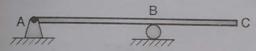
Singly overhanging beam (Having projection on one side)
